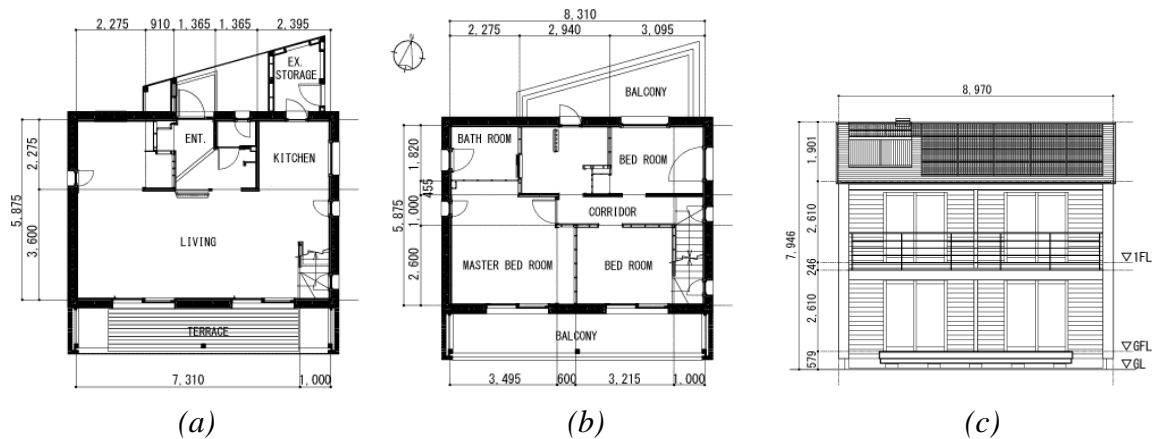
Plan and elevation of the test house. (a: the floor plan of the ground floor, b: the floor plan of 1st floor, c: the elevation of south façade)
